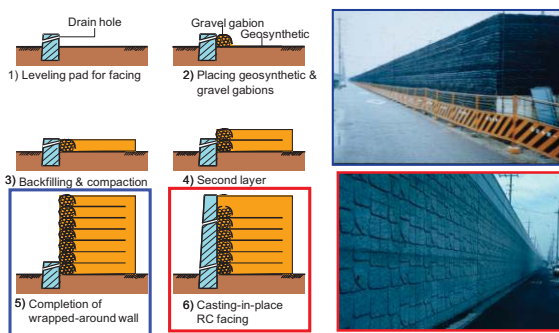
Staged construction of GRS Retaining Wall with FHR facing (Tatsuoka et al., 1997)
